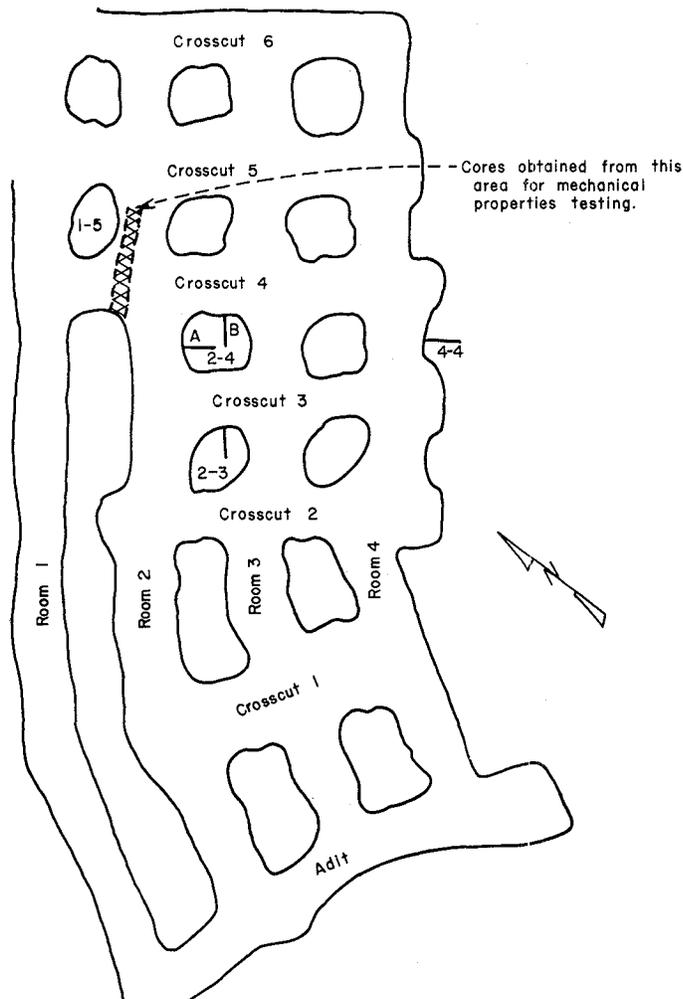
Plan View of Underground Workings at Colony Oil Shale Mine.
